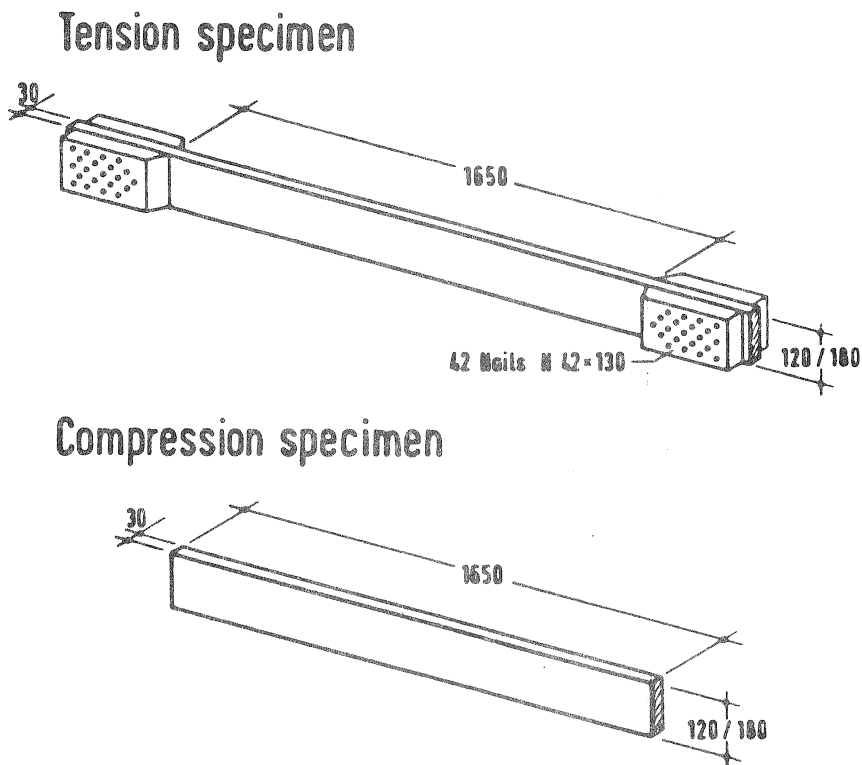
Specimens for tension and compression ramp load and constant load tests
